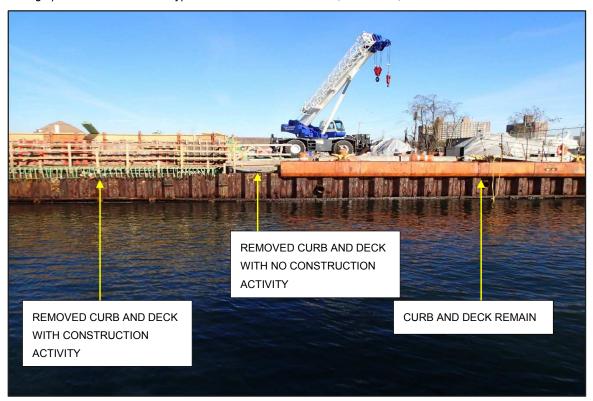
North Bulkhead – Steel sheet pile cell under North Pier (looking north)
